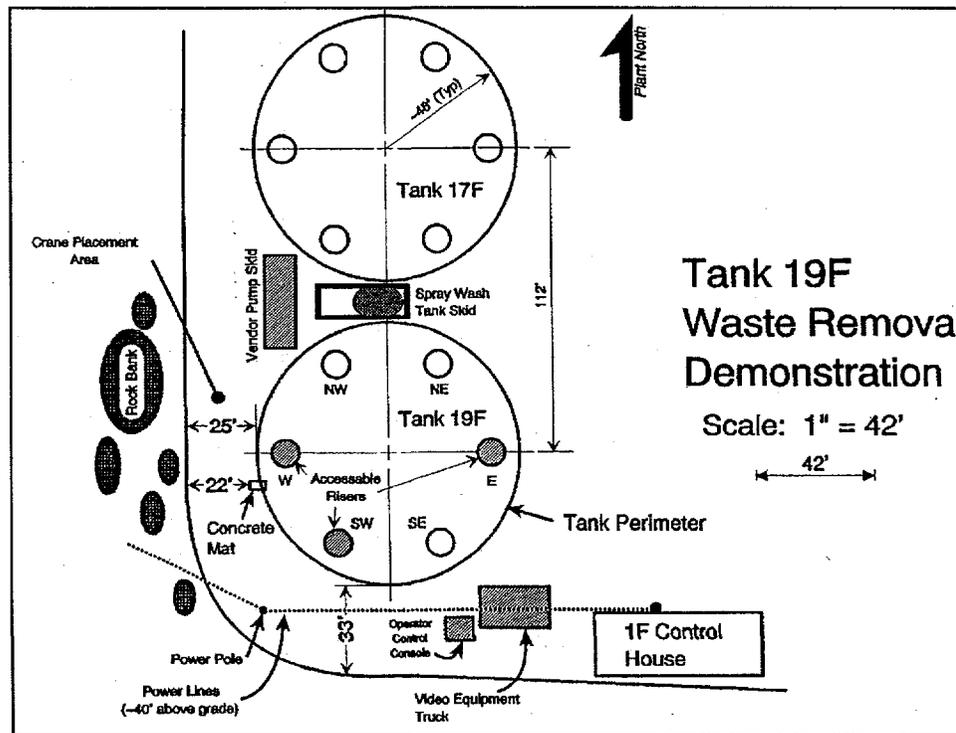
Savannah River Site Tank 19 Riser Locations
